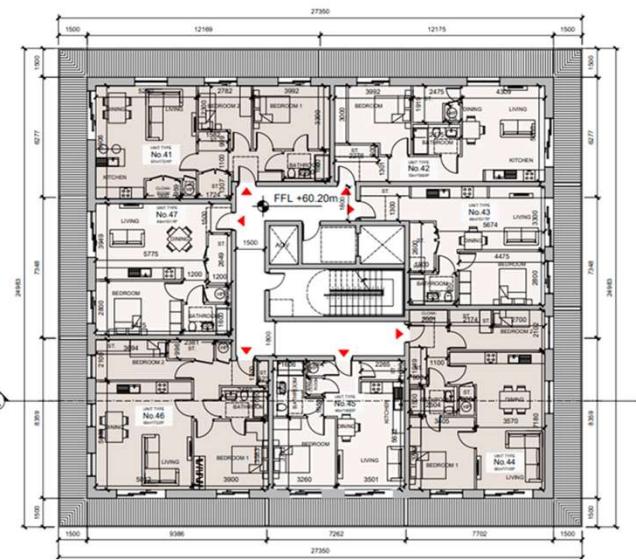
Fifth Floor Plan – Extracted from As Granted Scheme -
